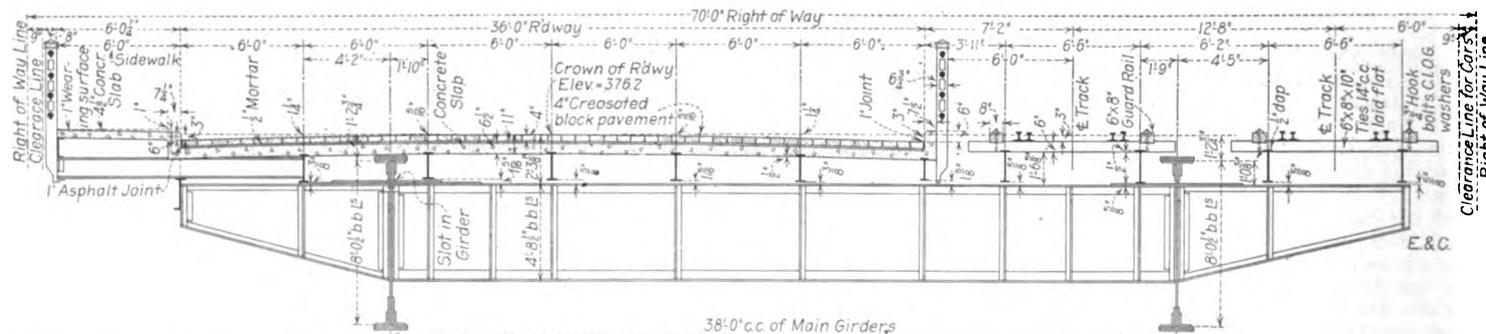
Cross Section of Floor System for Girder Spans in East Approach of East Kansas Ave. Bridge.
